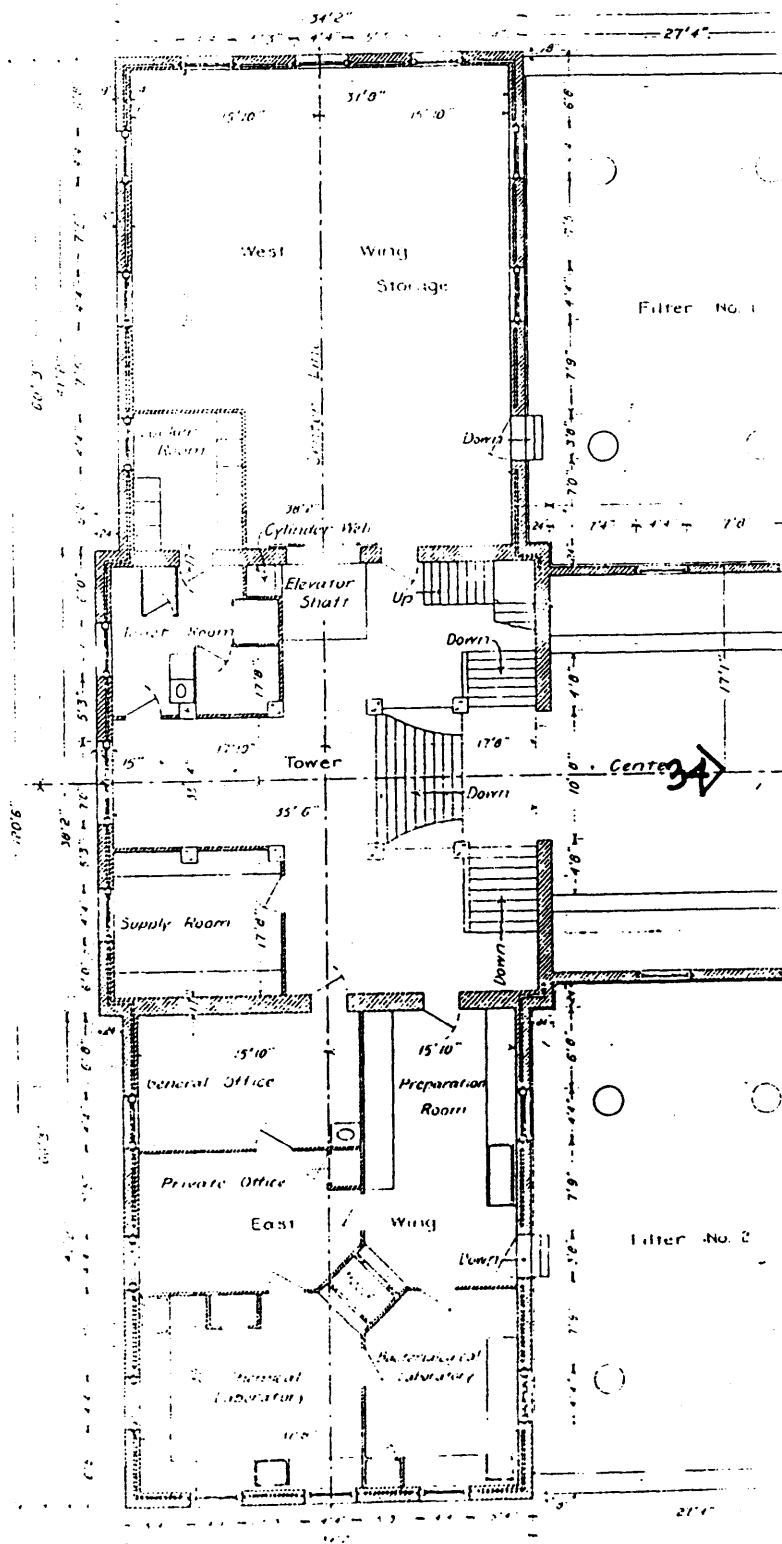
Site Plan for Equipment Review and Evaluation. (Adapted from New Milford Pumping Station Piping Plan 1957) Scale: 1" = 20'
